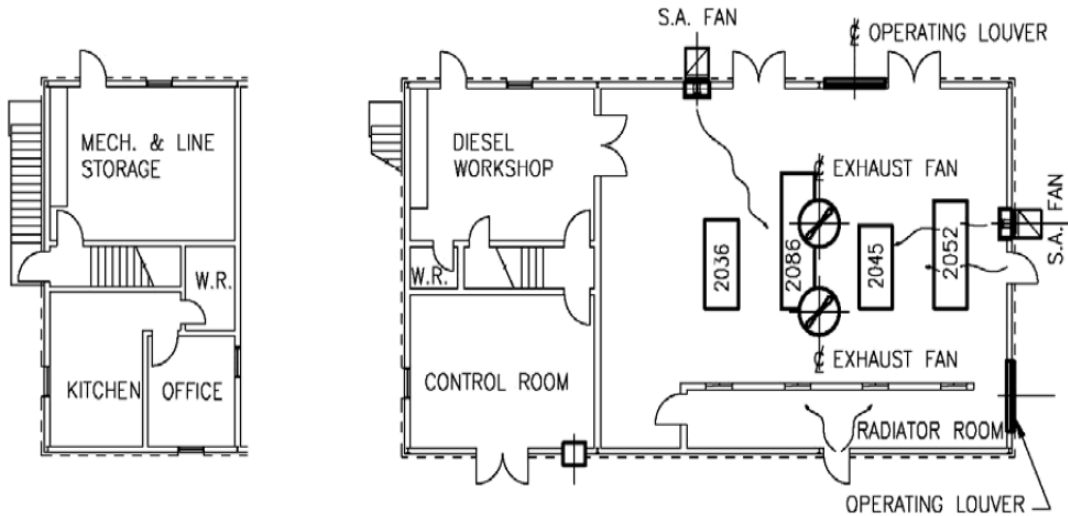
Cartwright Plant Ventilation Existing Arrangement
